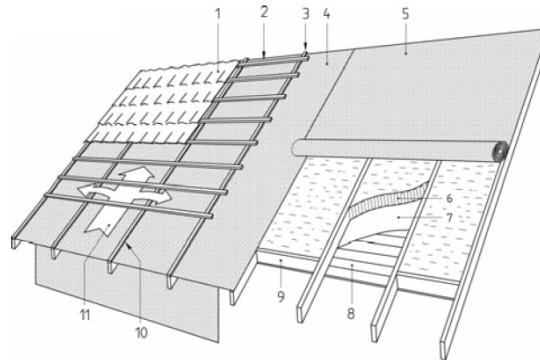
Figure of a typical ventilated roof with ventilation directly above the roofing underlay (wind barrier). The numbers refer to: 1. roofing tiles or sheets, 2. roofing battens, 3. counterbattens, 4. roofing underlay, 5. example of a specific underlay system installation, 6. thermal insulation, 7. vapour barrier, 8. ceiling, 9. noggings, 10. cautiously clamped overlap joints, and 11. cross ventilation between underlay and roofing. (Figure from <http://tjenester.byggforsk.no/prodok/ntg/dok/2375/2375ge.pdf>.)
